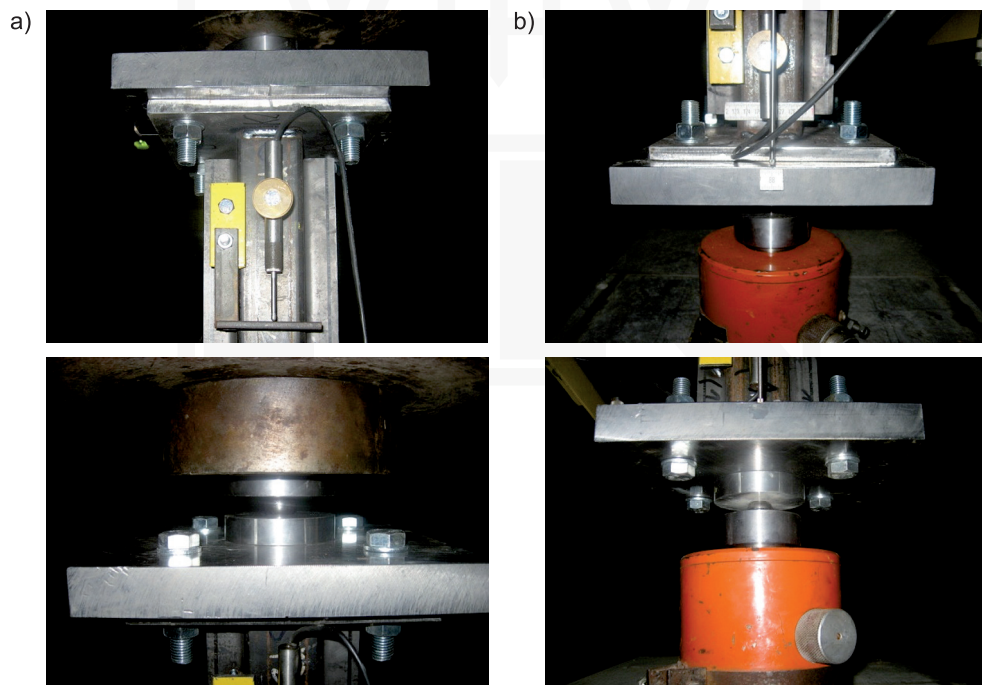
End fixtures for tested columns: a) upper head, b) bottom head
